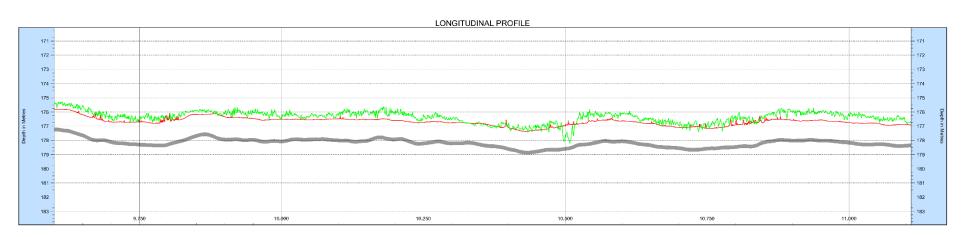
PL4556 As-built alignment sheet KP9.600 to KP11.110
